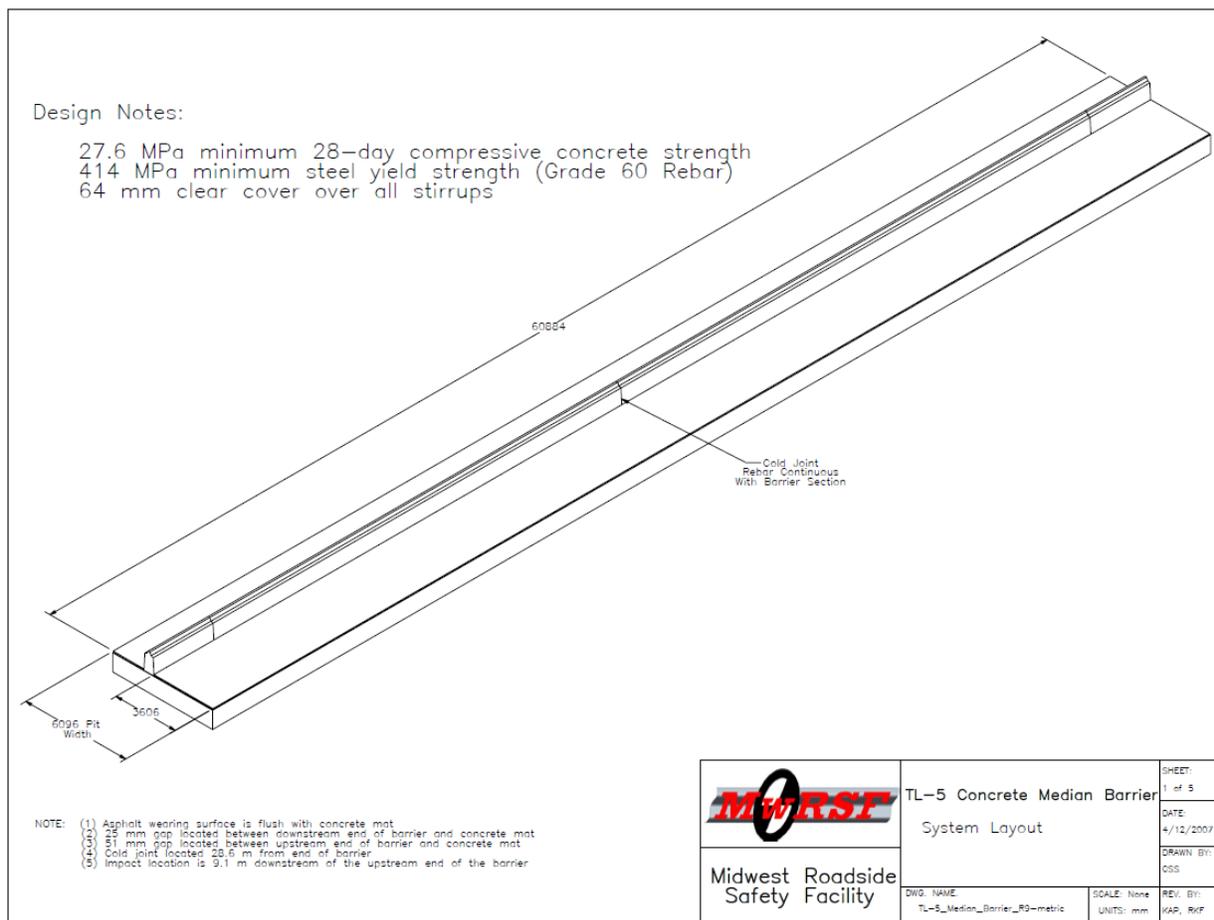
Test installation layout, Test No. TL5CMB-2 [8].
